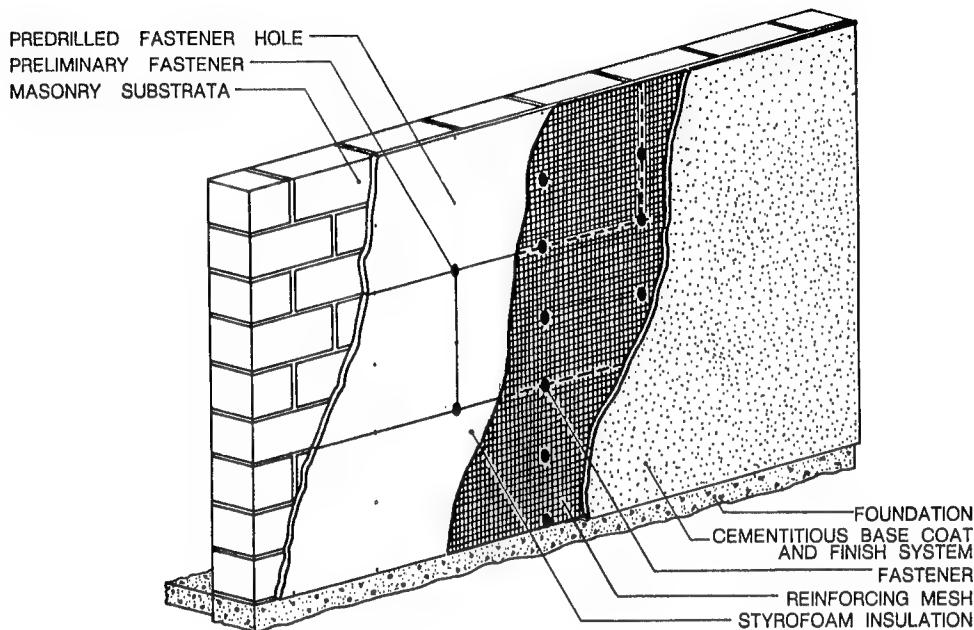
Application Detail for Class PM EIFS Over a CMU Block Wall.
